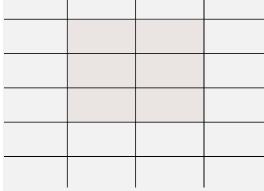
Horizontal Sheeting - Stretcher Bond Pattern
